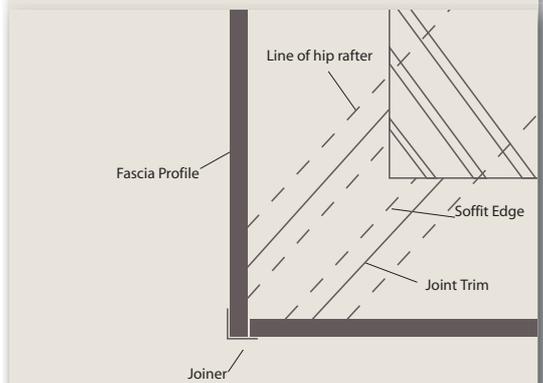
Soffit Corner detail showing soffit returns, corner trim, etc.
